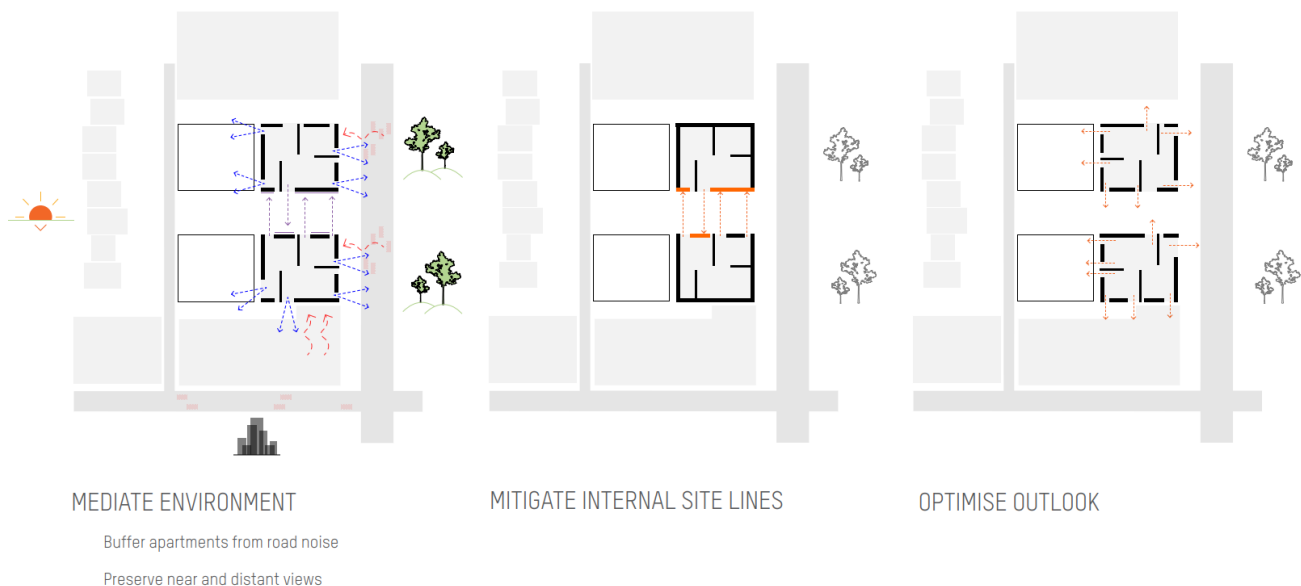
Excerpt UCR detailing tower facade strategy to optimise outlook while minimising direct view lines (JCB)
